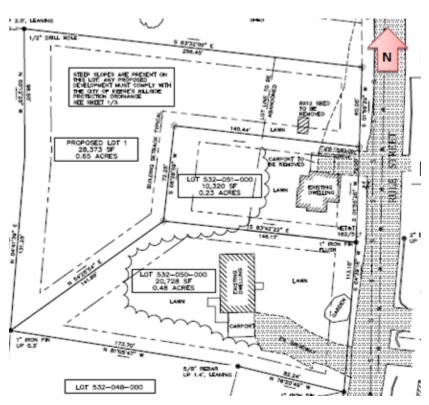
The proposed configuration of the new lots following the subdivision and boundary line adjustment.
